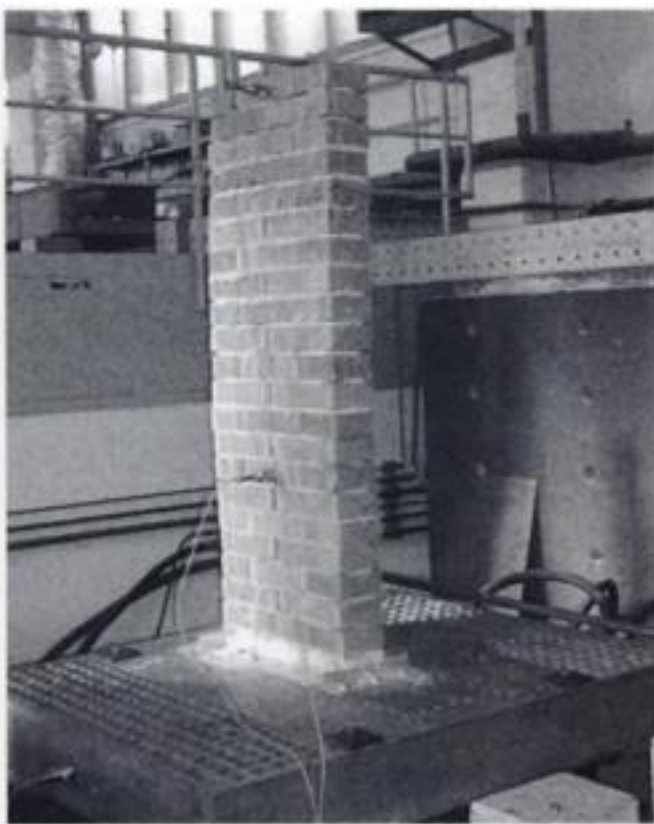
Brick column with plastic sheets in horizontal layers on shaking table.
